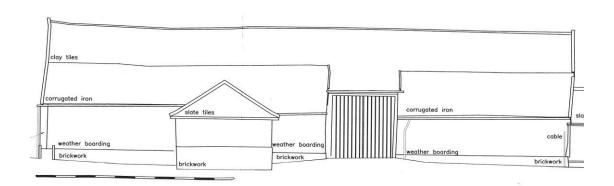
Southern external elevation of the western shelter shed (4) showing the barn (6) in the rear
